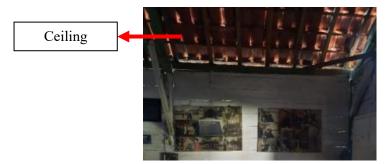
Ceiling in the living room of Mr. Lasiyo's house Source: Widyaswati, 2023
